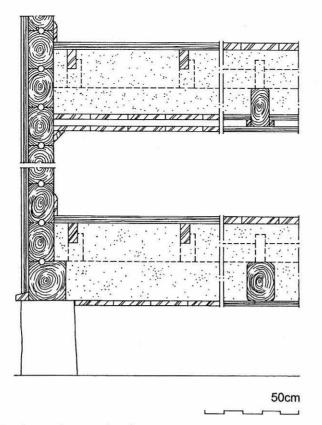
Joint of exterior wall to floor and intermediate floor structures in an two-storey house built in Tampere 1920-21. Vertical section 1/20.
